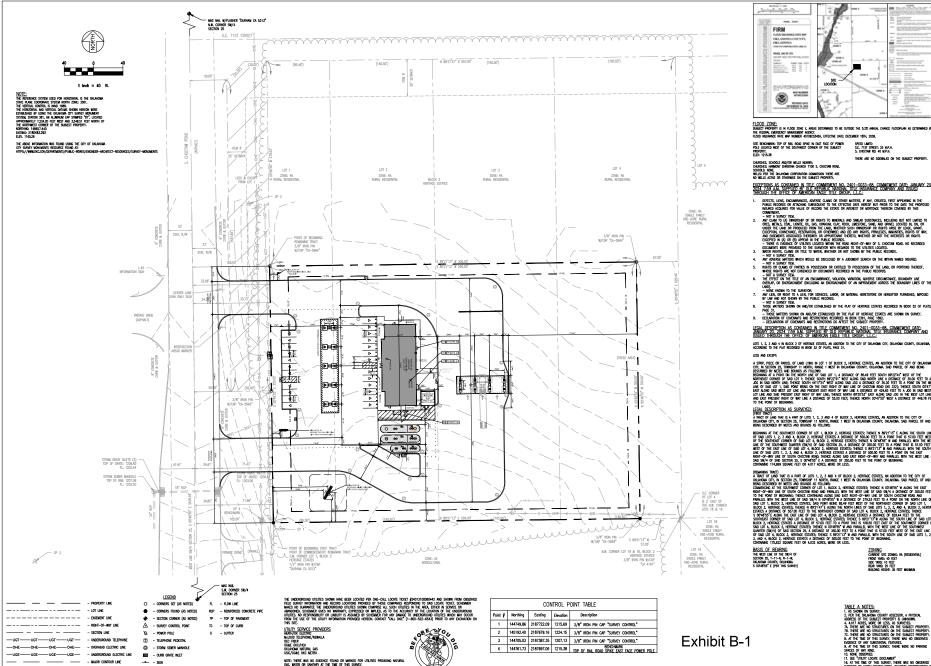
Conceptual Master Development Plan (south tract)
